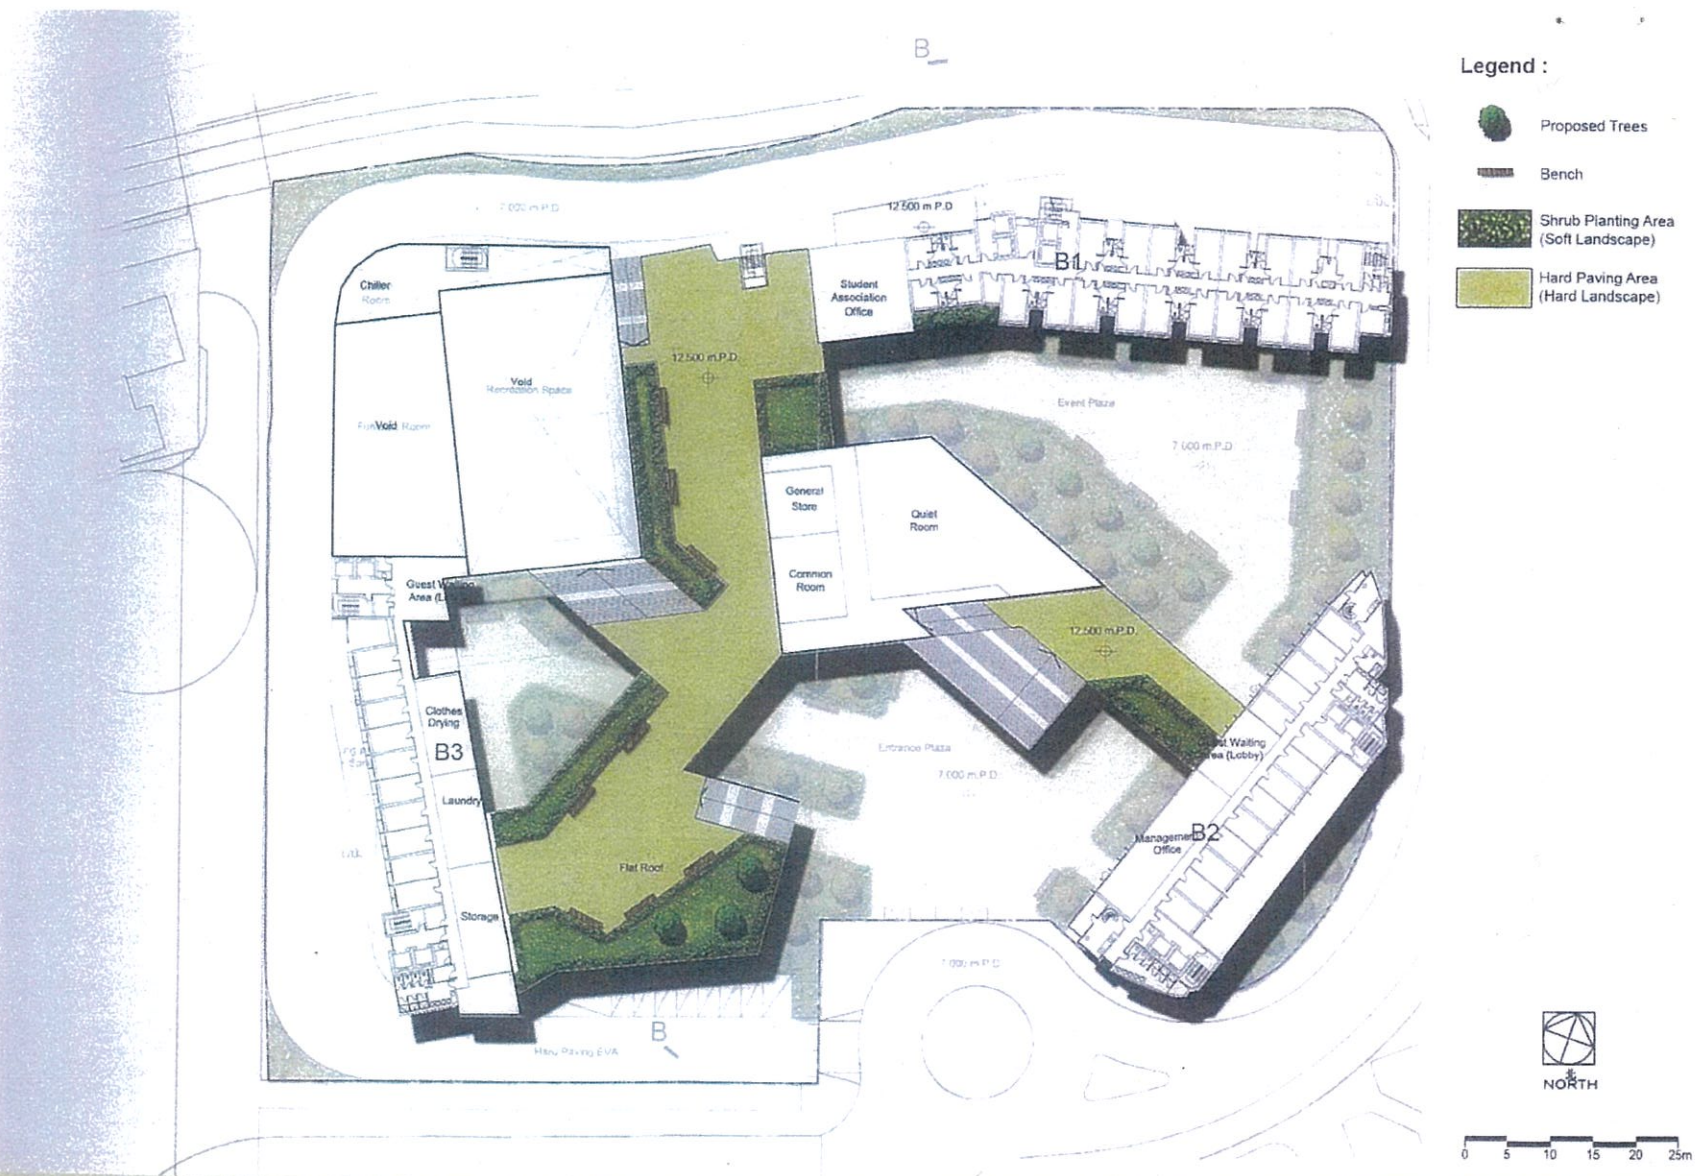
D Schematic Landscape Master Plan Ground Floor (+7mPD)
